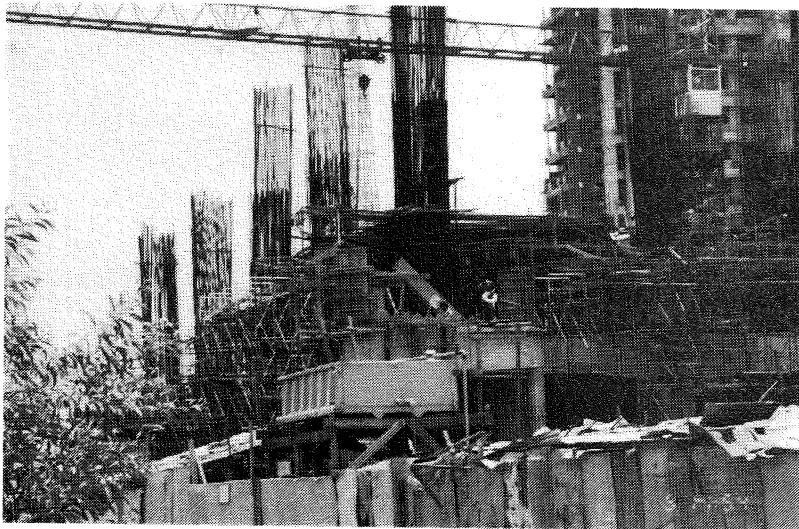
Multi-storey, cast insitu concrete frame, Manila. Note well confined beam-column joint region
